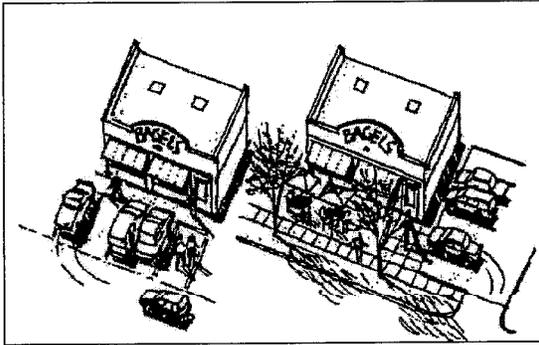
To the maximum extent feasible, parking should be located to the side or rear of a building.
